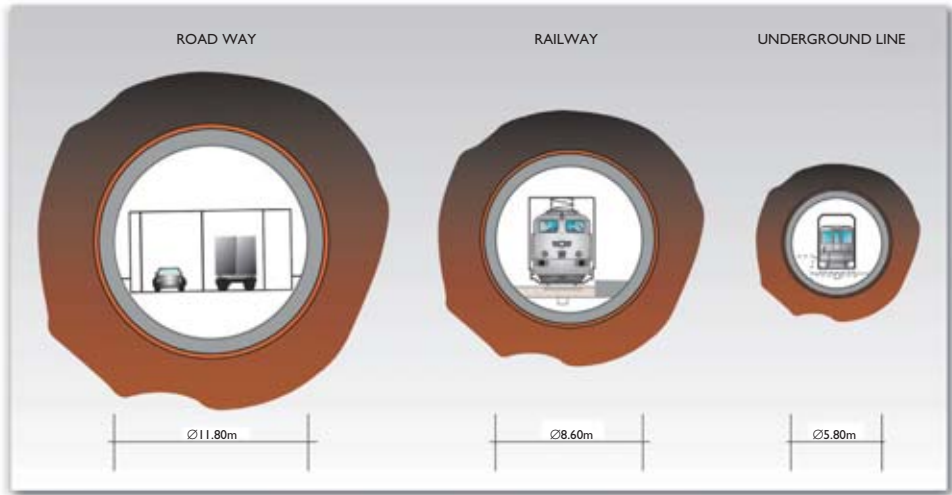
Comparative dimensions of urban road tunnel and railway tunnels.
